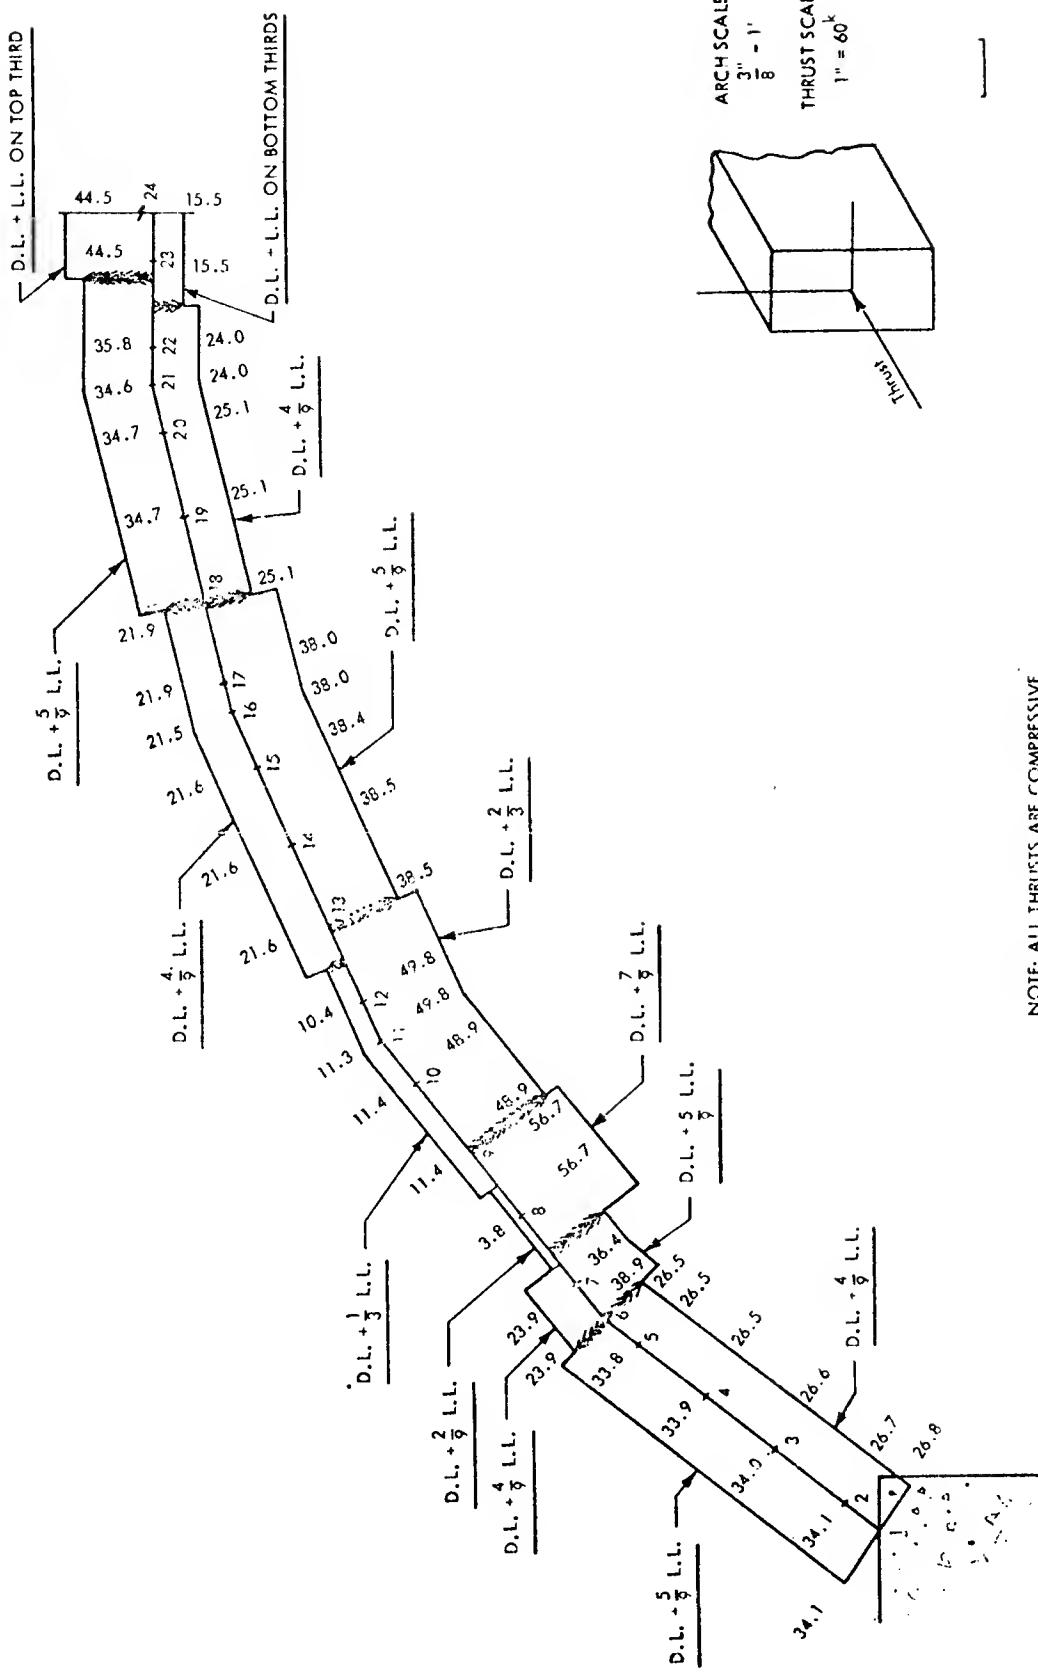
(Drawing) Stainless-Steel Arch Thrusts Associated with Moment Envelope of Oroville Power Plant Intake Structure
